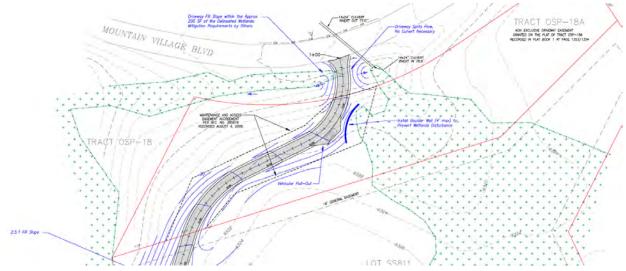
Site Grading and Drainage Plan, per application materials for Lot SS811
